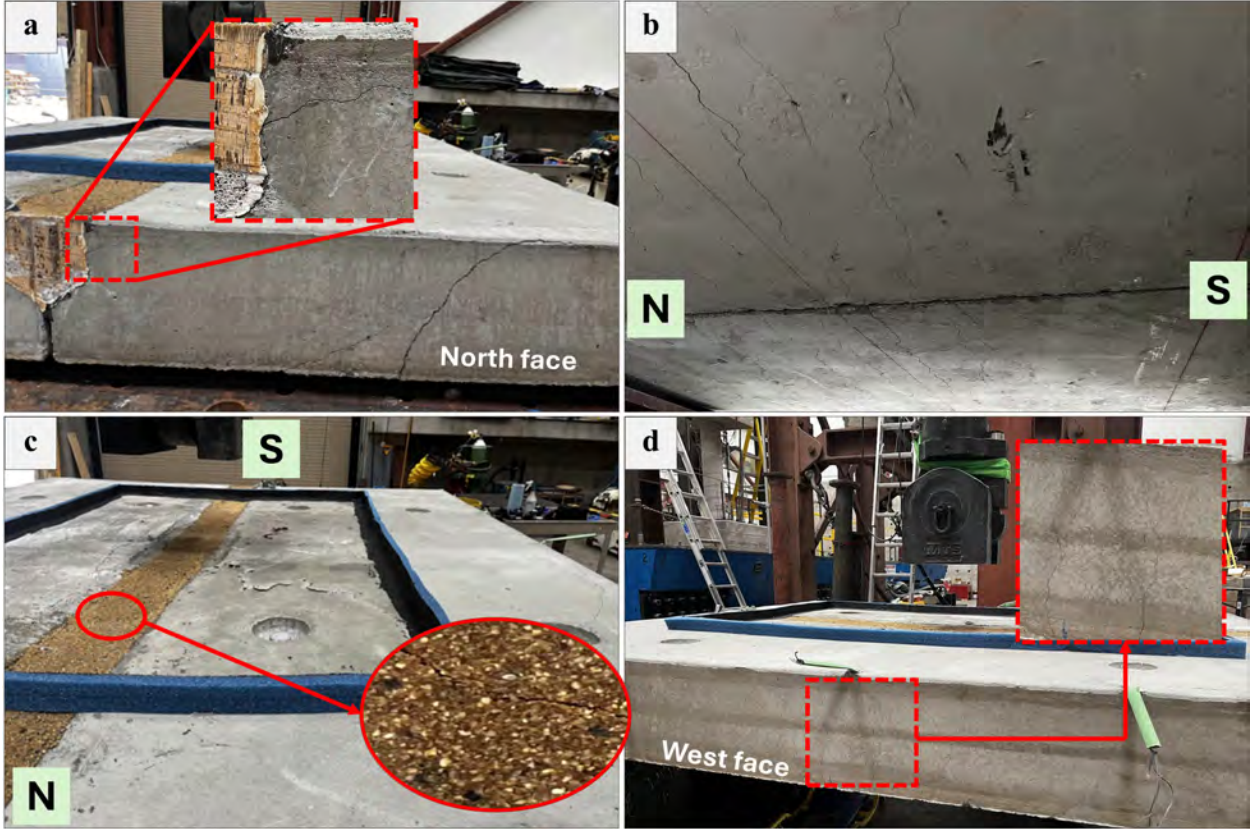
Crack patterns in a) North face of west panel b) Bottom surface of the slab c) Top of the slab and d) West face of the EPC specimen.
